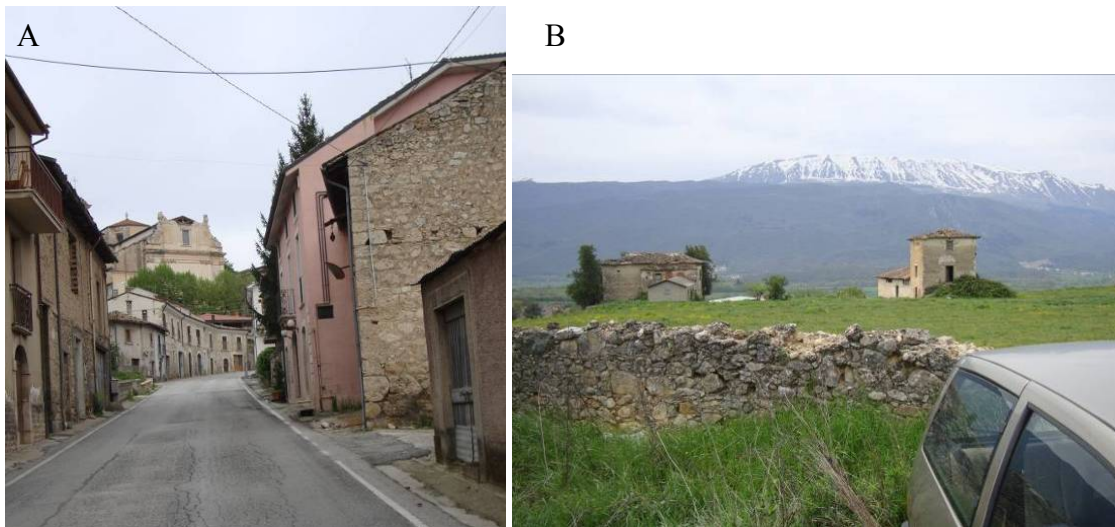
San Demetrio ne' Vestini (A) access road to the village showing mostly masonry buildings with no damage, (B) old masonry buildings with no damages.
